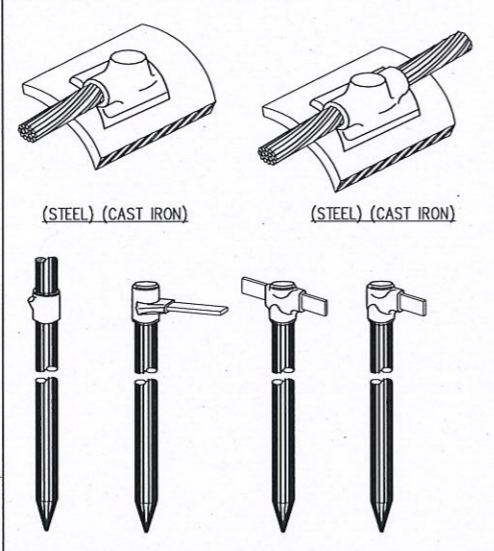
DETAIL-STANDARD SET OUT (EXCEPT SPECIFIED OTHERWISE ON THE LAYOUT)
